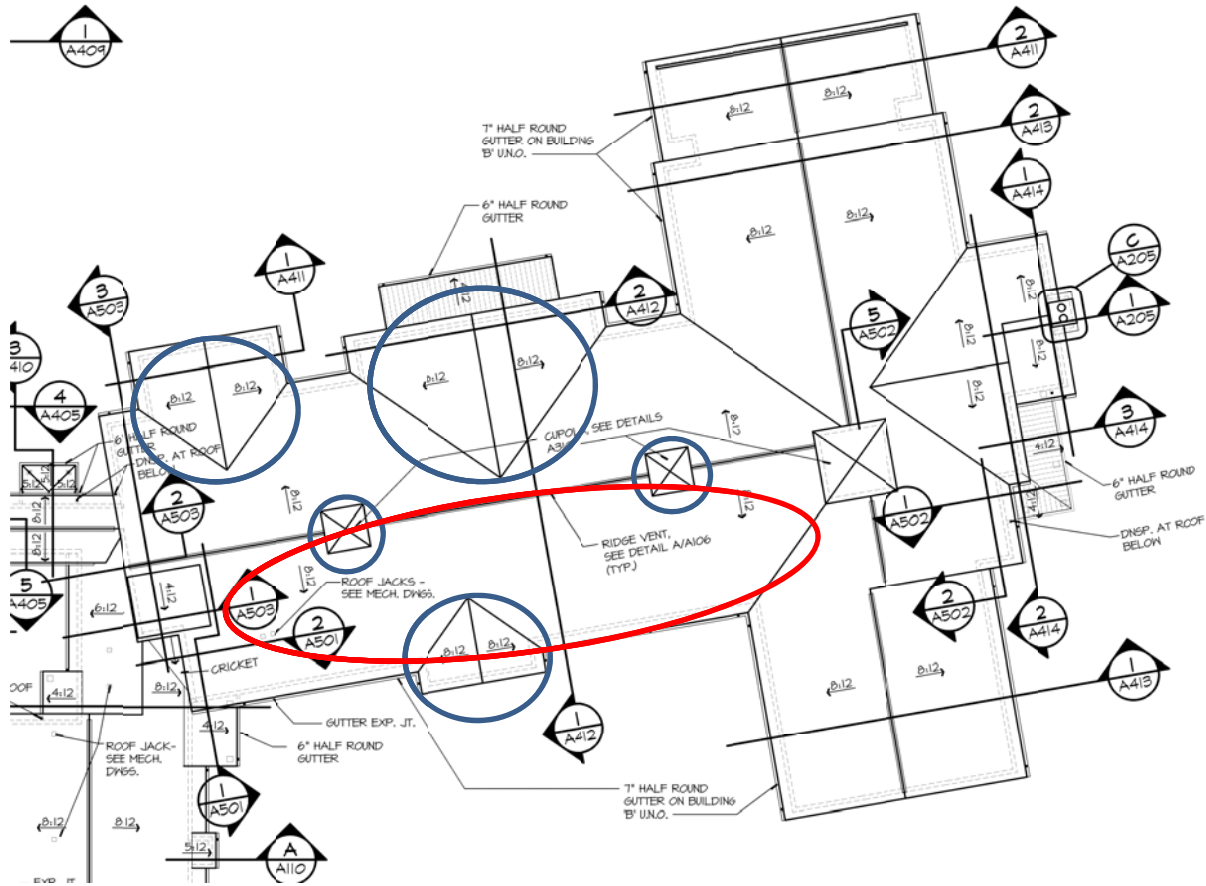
Building B south facing roof Solar panel in red area and roof architectural in blue
